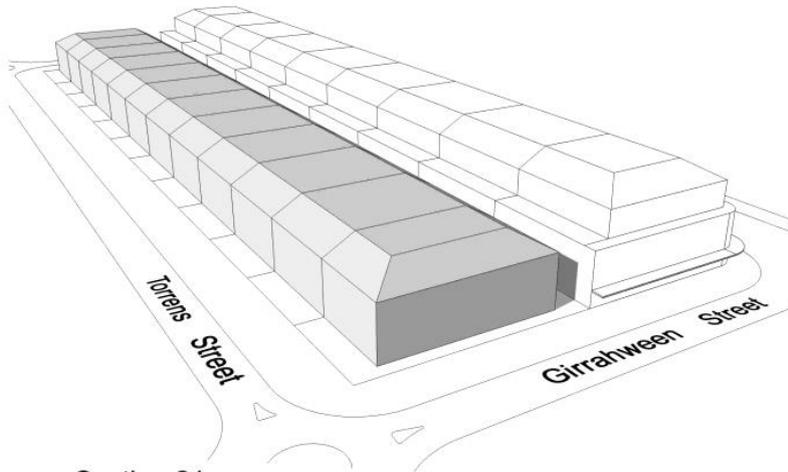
Braddon – Building Envelope (Blocks 1 to 12, Section 21)
